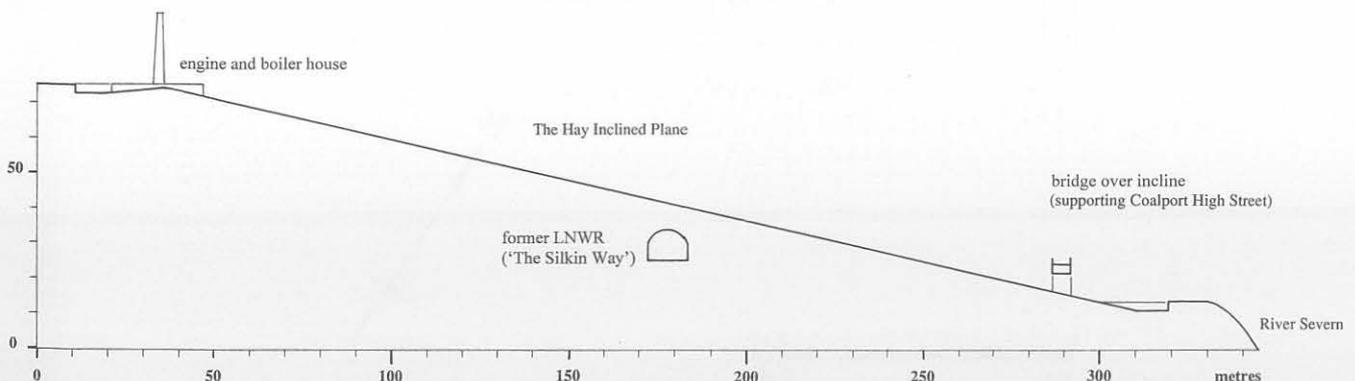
Profile of the Hay Inclined Plane. It has a gradient of 23% and a short counter-plane at the top. A bridge was made underneath for the London and North Western Railway (Coalport branch) in 1857.
